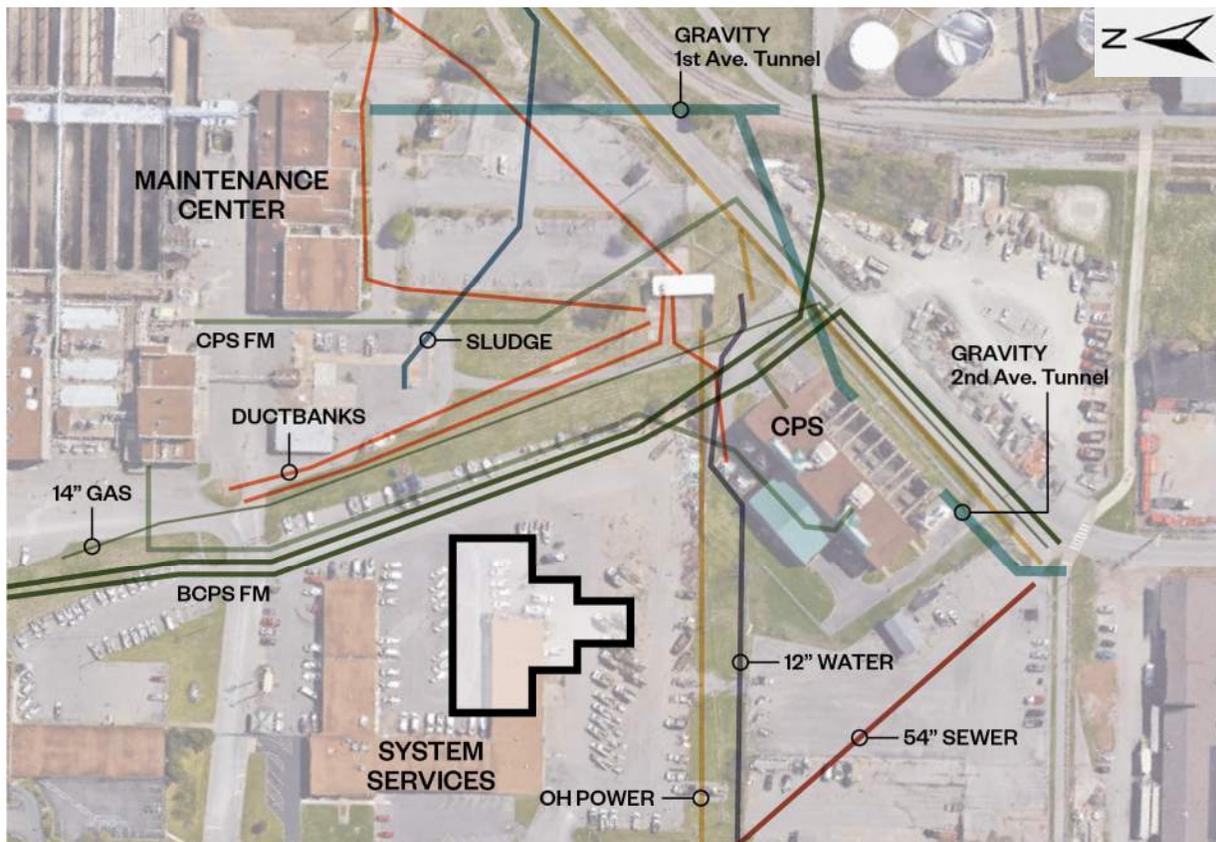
Site Layout for Headworks Location Alternative No. 2
